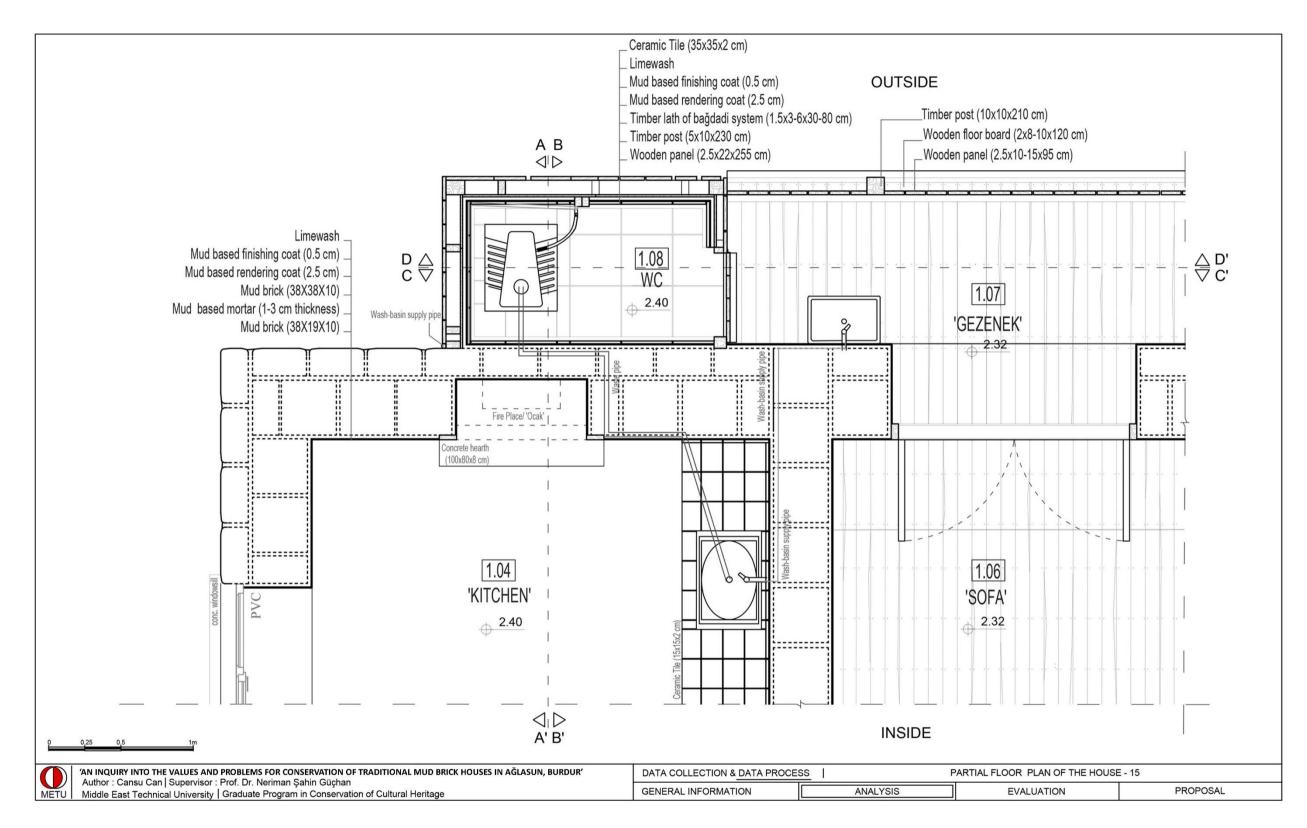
Floor Plan of the WC and Its Relation with the Kitchen.
